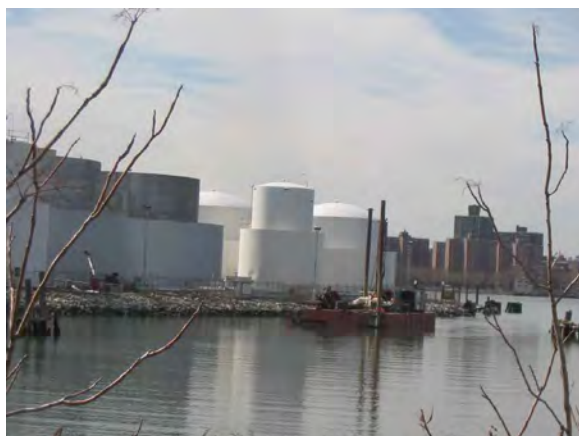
Crew drilling within Bushwick Creek Inlet, facing west.
